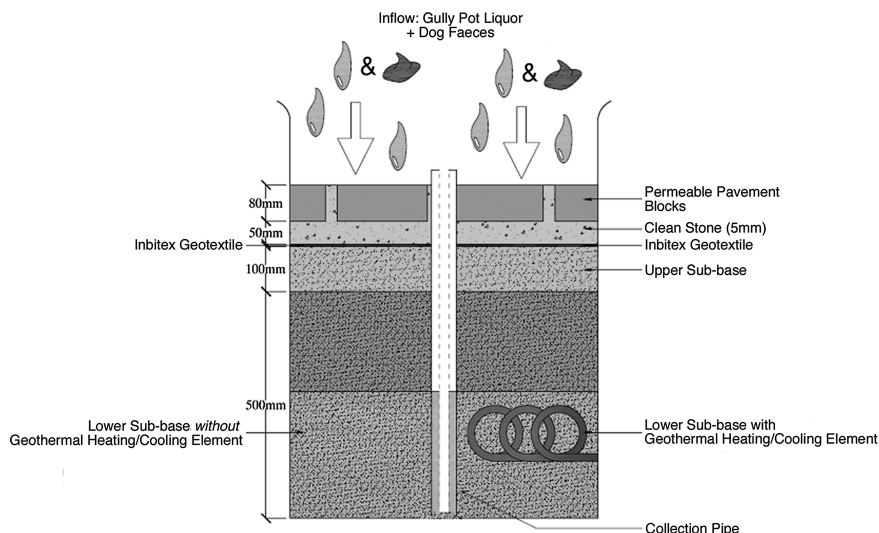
Combined pavements and geothermal heating/cooling system (*right hand-side*) and standalone pavement system (*left hand-side*); after Tota-Maharaj and Scholz (2010)
